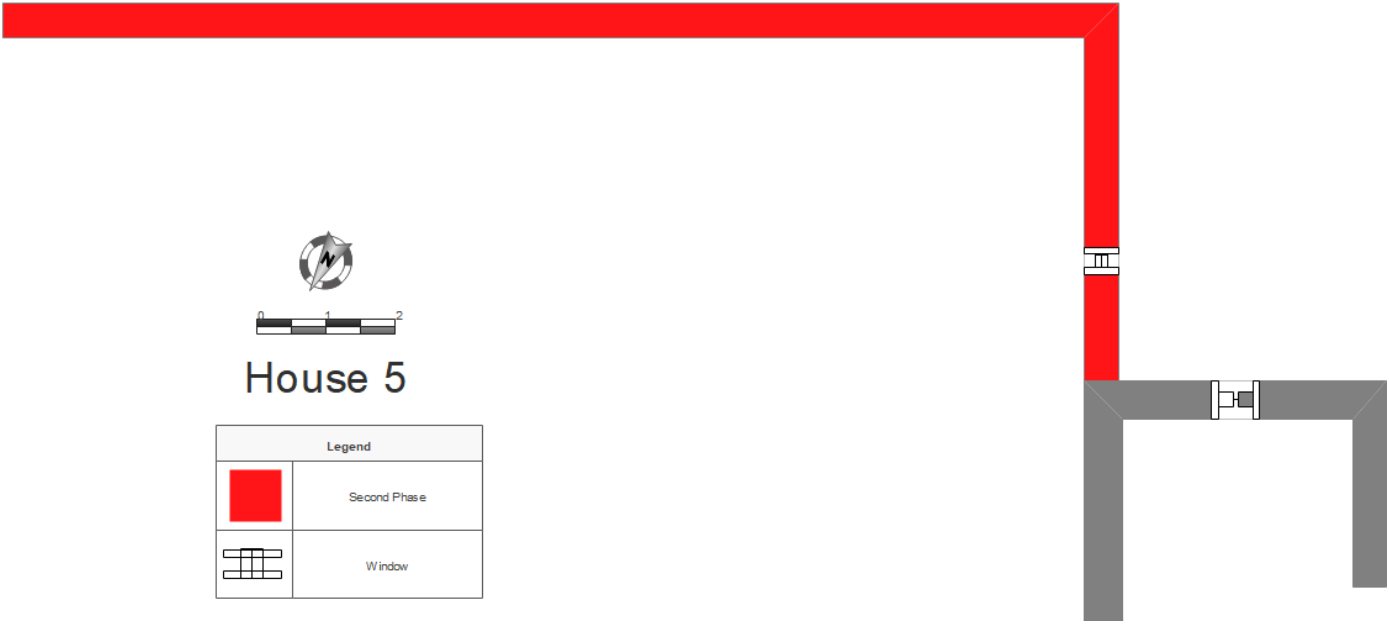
Plan of House 5 at Tigani. (M. Pawlowski)
